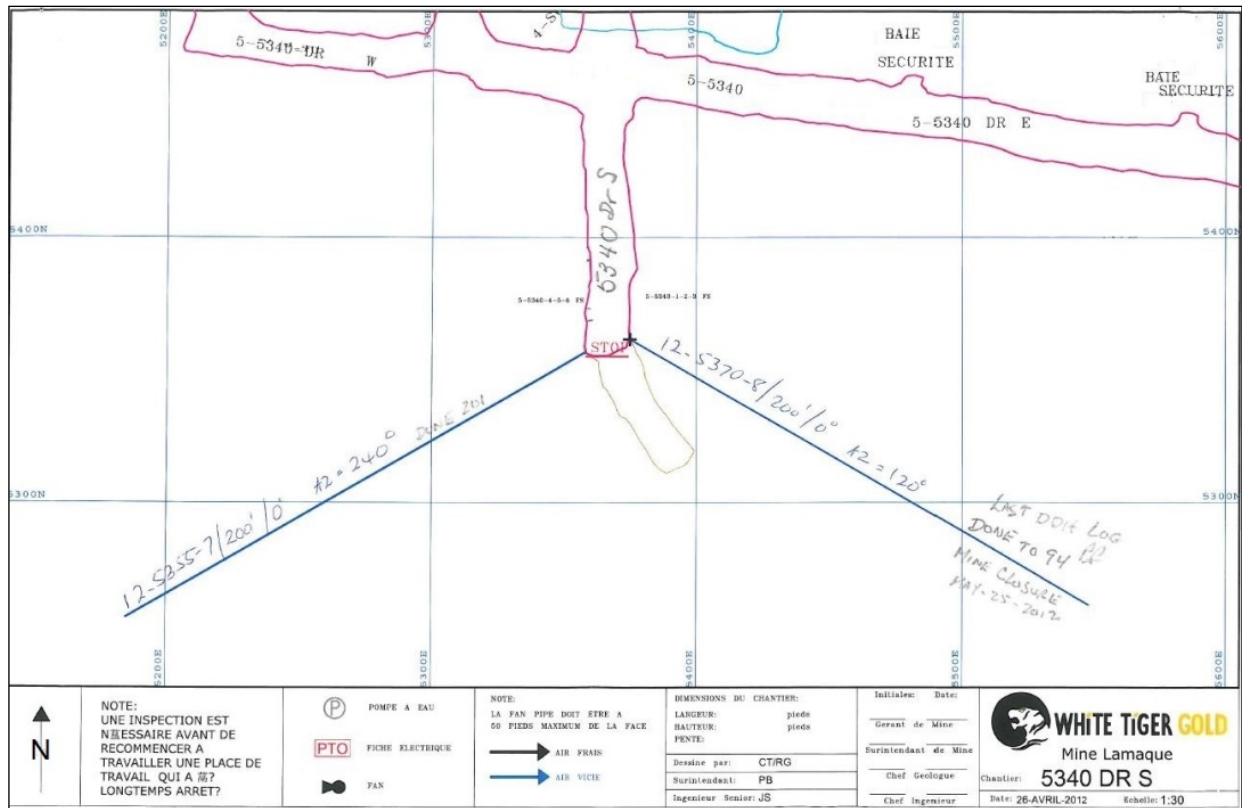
Level plan of drift 5-5340, Lamaque mine, and underground drill holes.
